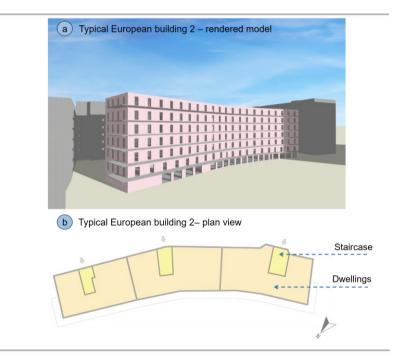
Typical European building 2: a) 3D view; b) plan view and thermal zones
